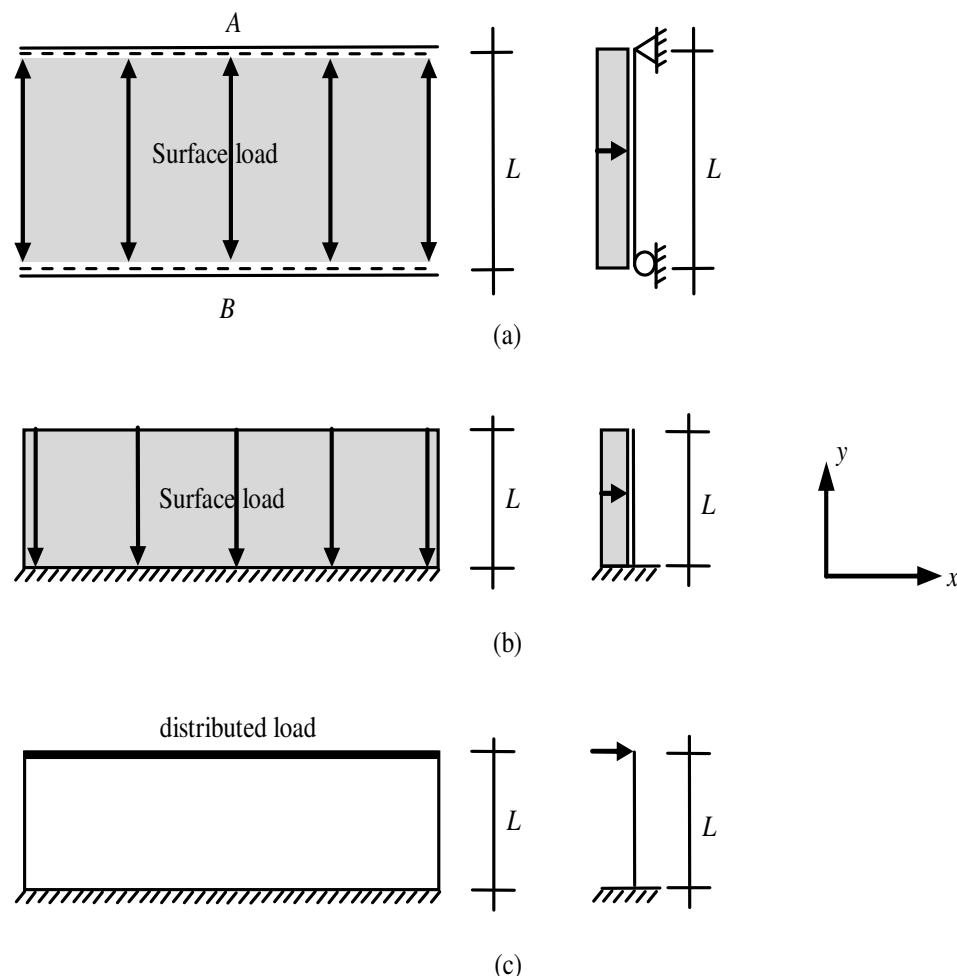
One-way slab action: (a) one-way simply supported slab under surface load (b) cantilever slab surface loads. (b) cantilever slab under distributed line loads.
